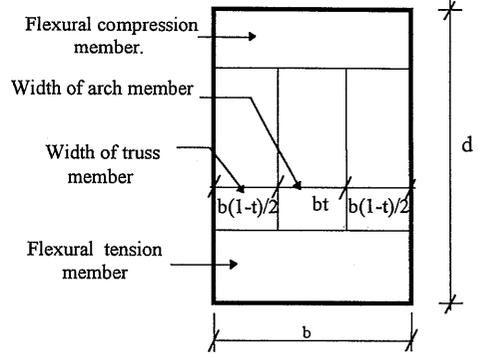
Cross section of concrete beam in the Modified Lattice Model
